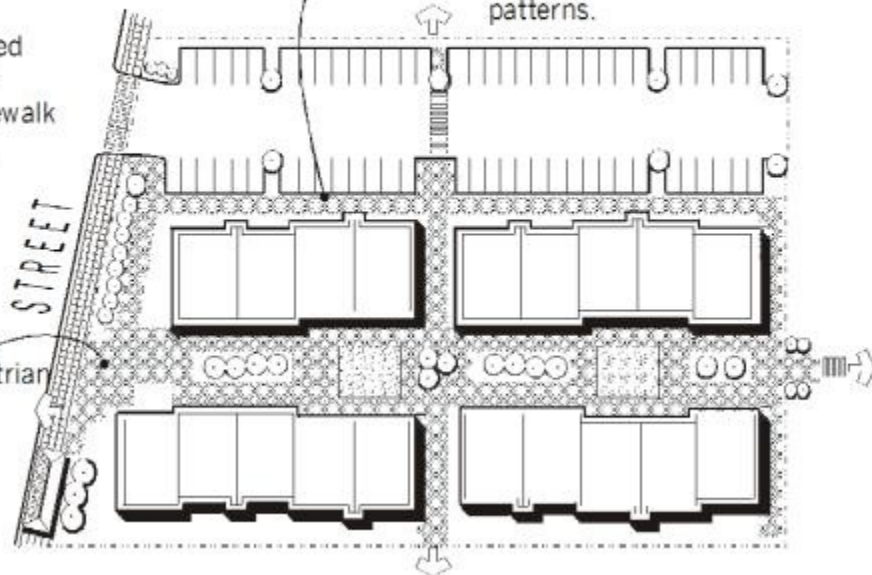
(D): Avoid parking that dominates the site. Encourage parking located behind or on the side of buildings and common open space between buildings.
